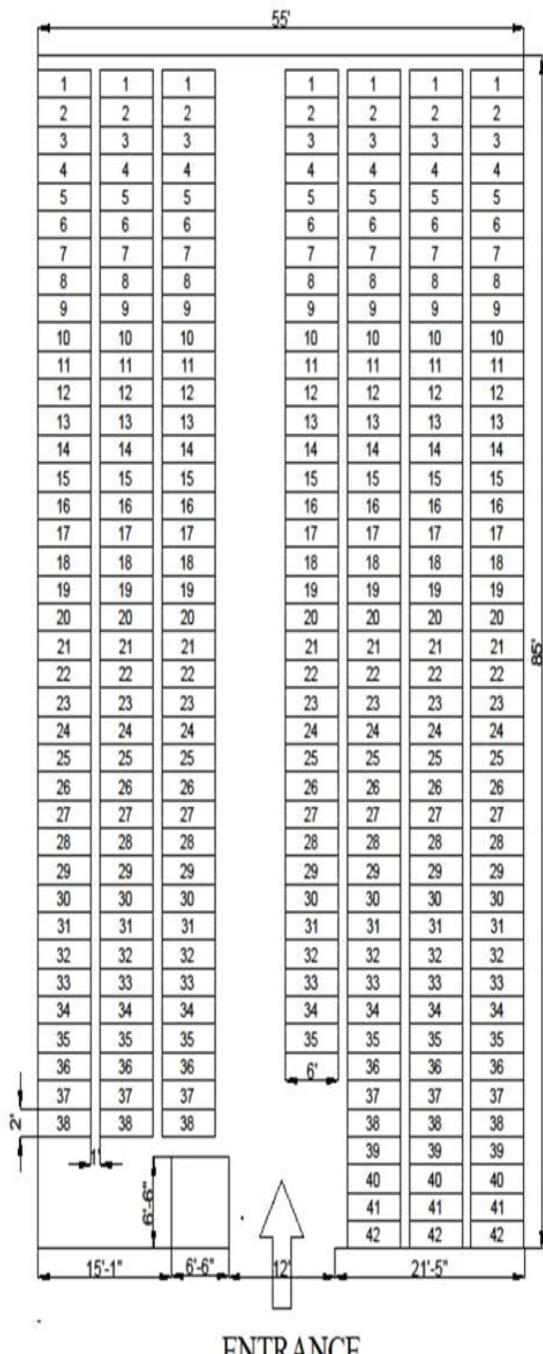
Layout of Parking Lot in Padmavati Shopping Complex
